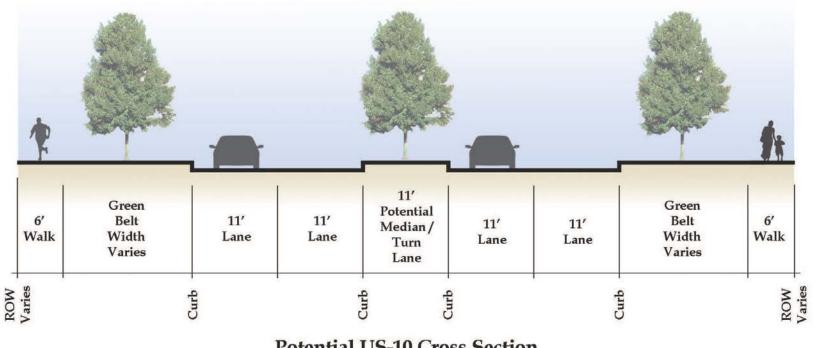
Illustration K. Proposed US-10 Cross Section – Jackson Road to Dennis Road
